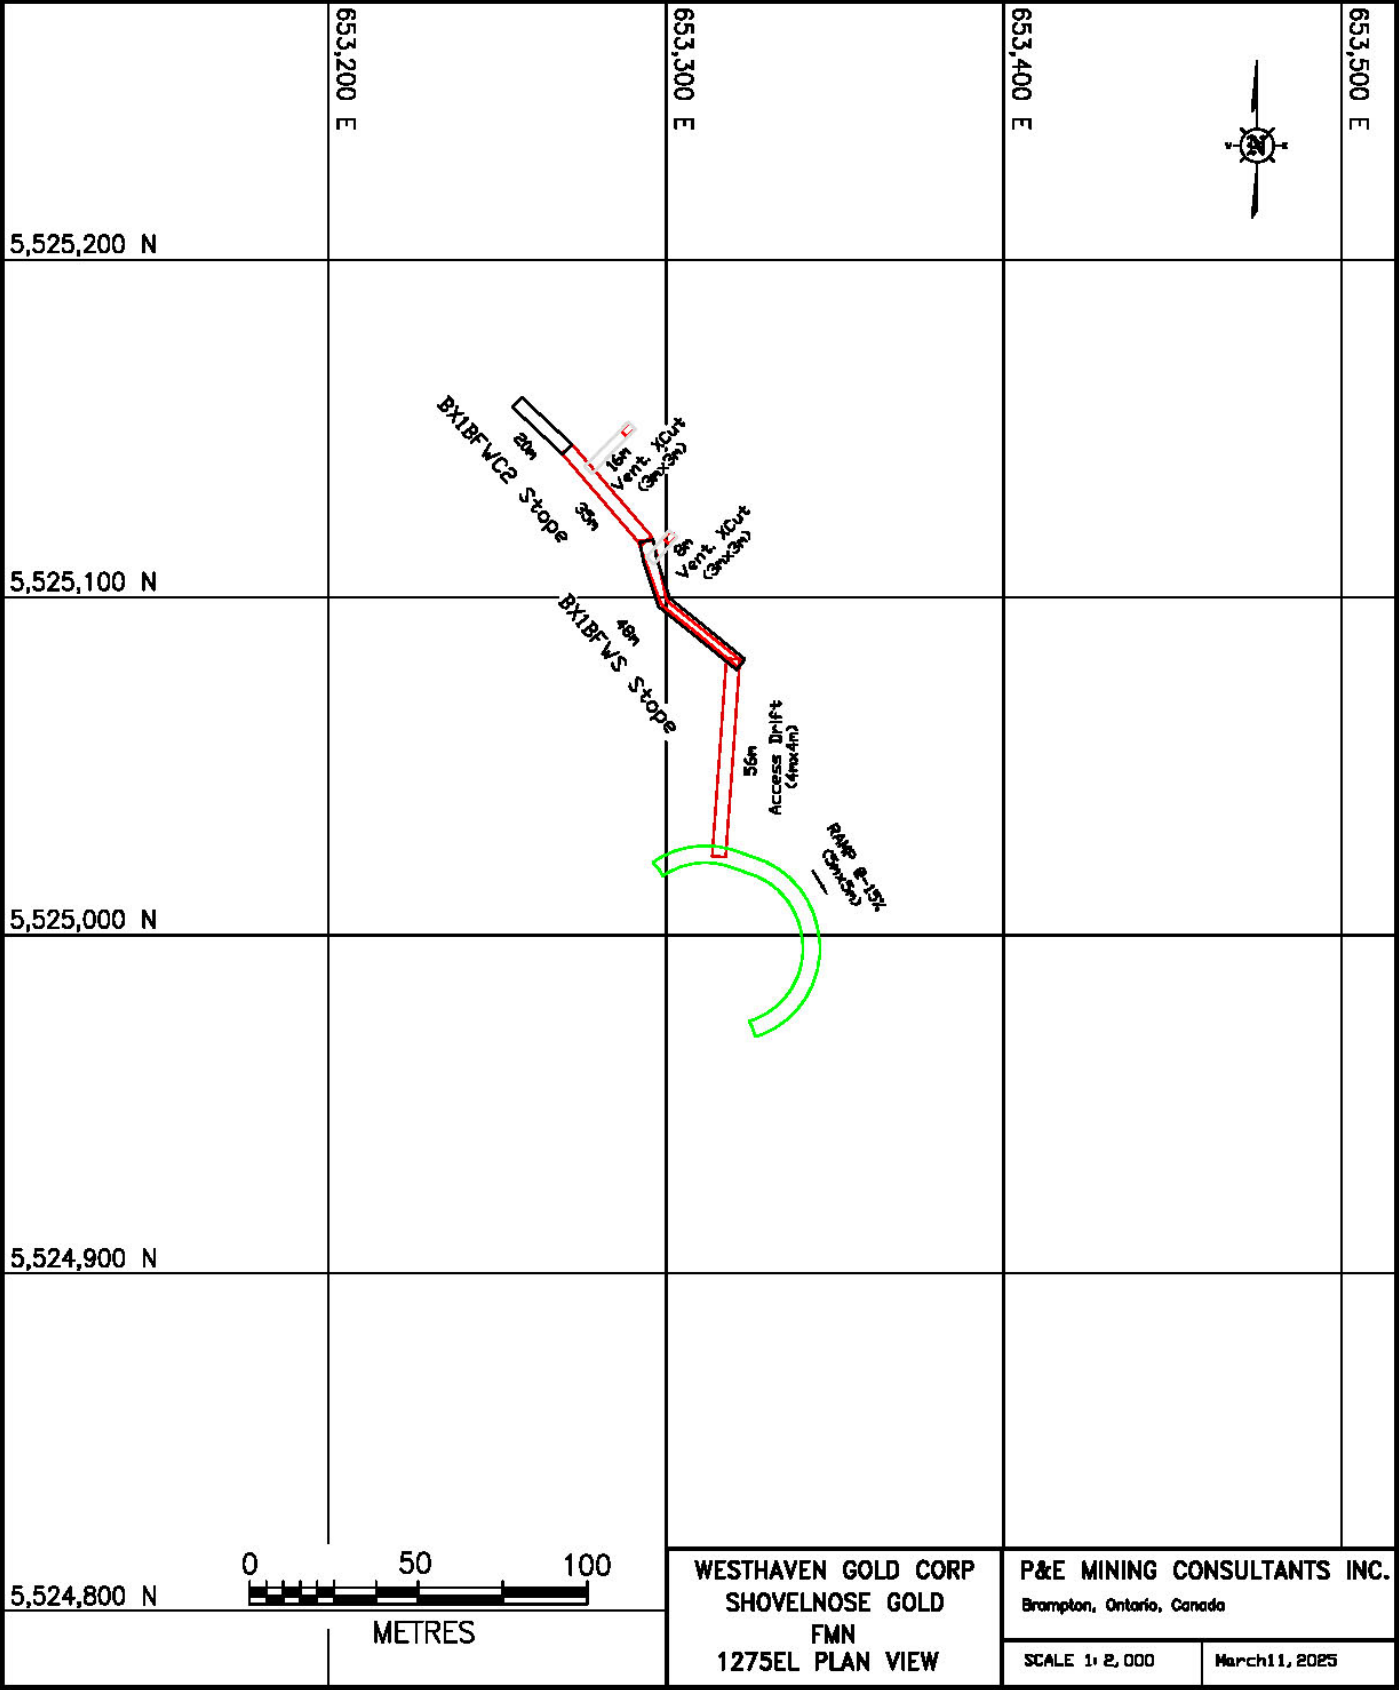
FMN ZONE PLAN VIEW 1275EL
